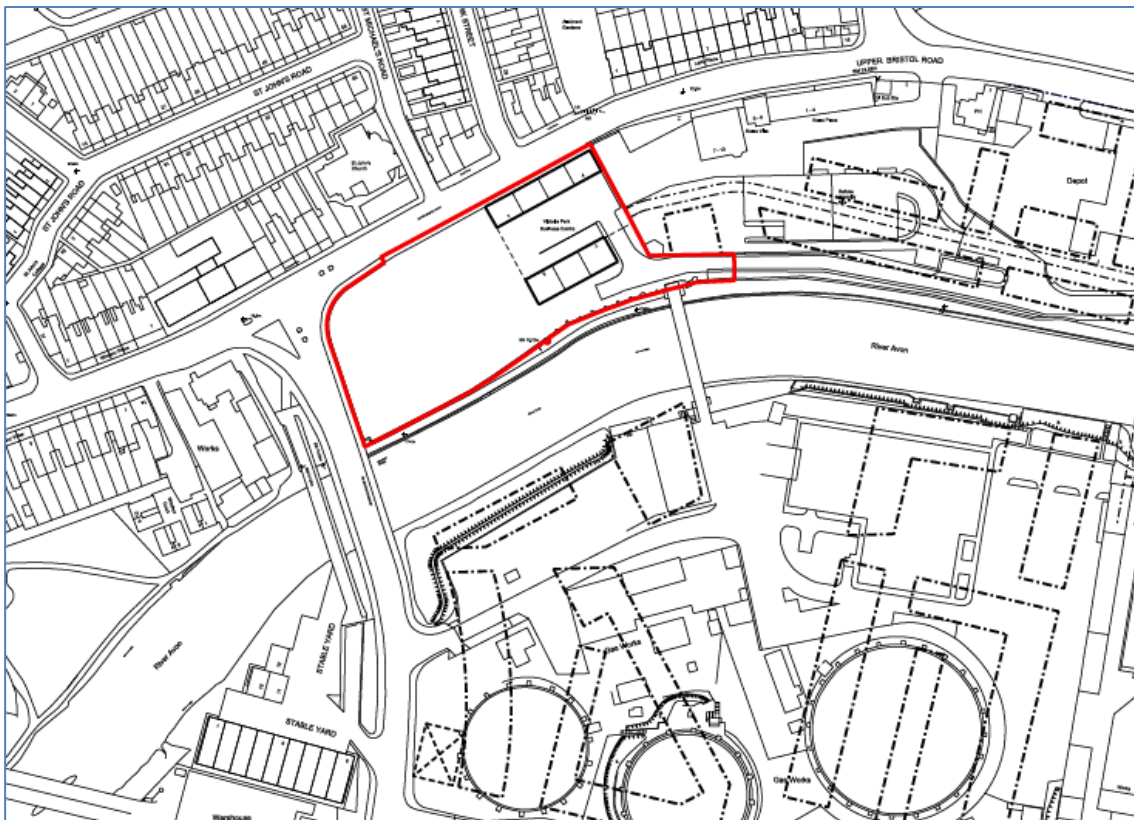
Extract from Site Location Plan – a full extract is shown at Appendix A.
